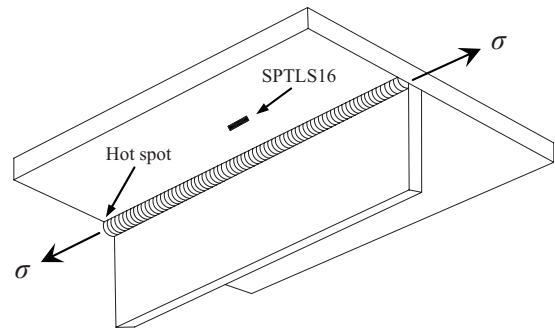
Weld stress analysis of welded joint at strain gauge SPTLS16
